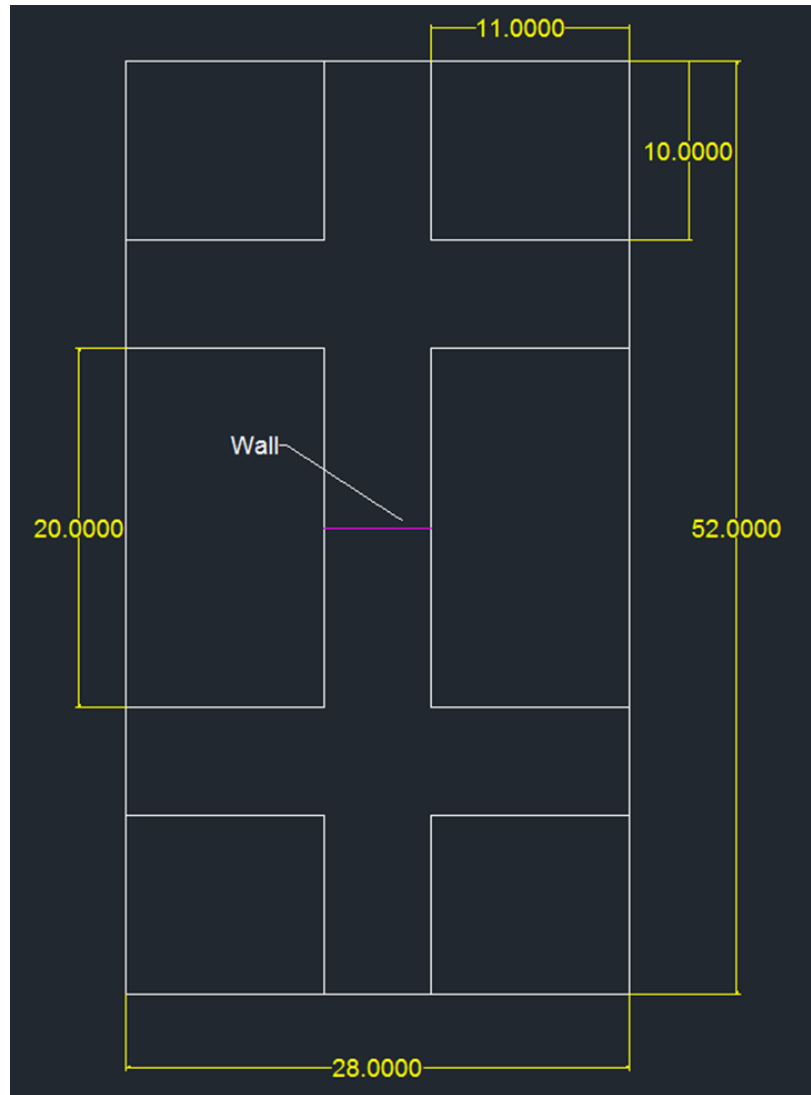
Final FLAC3D Model Setup (dimensions in meters)
